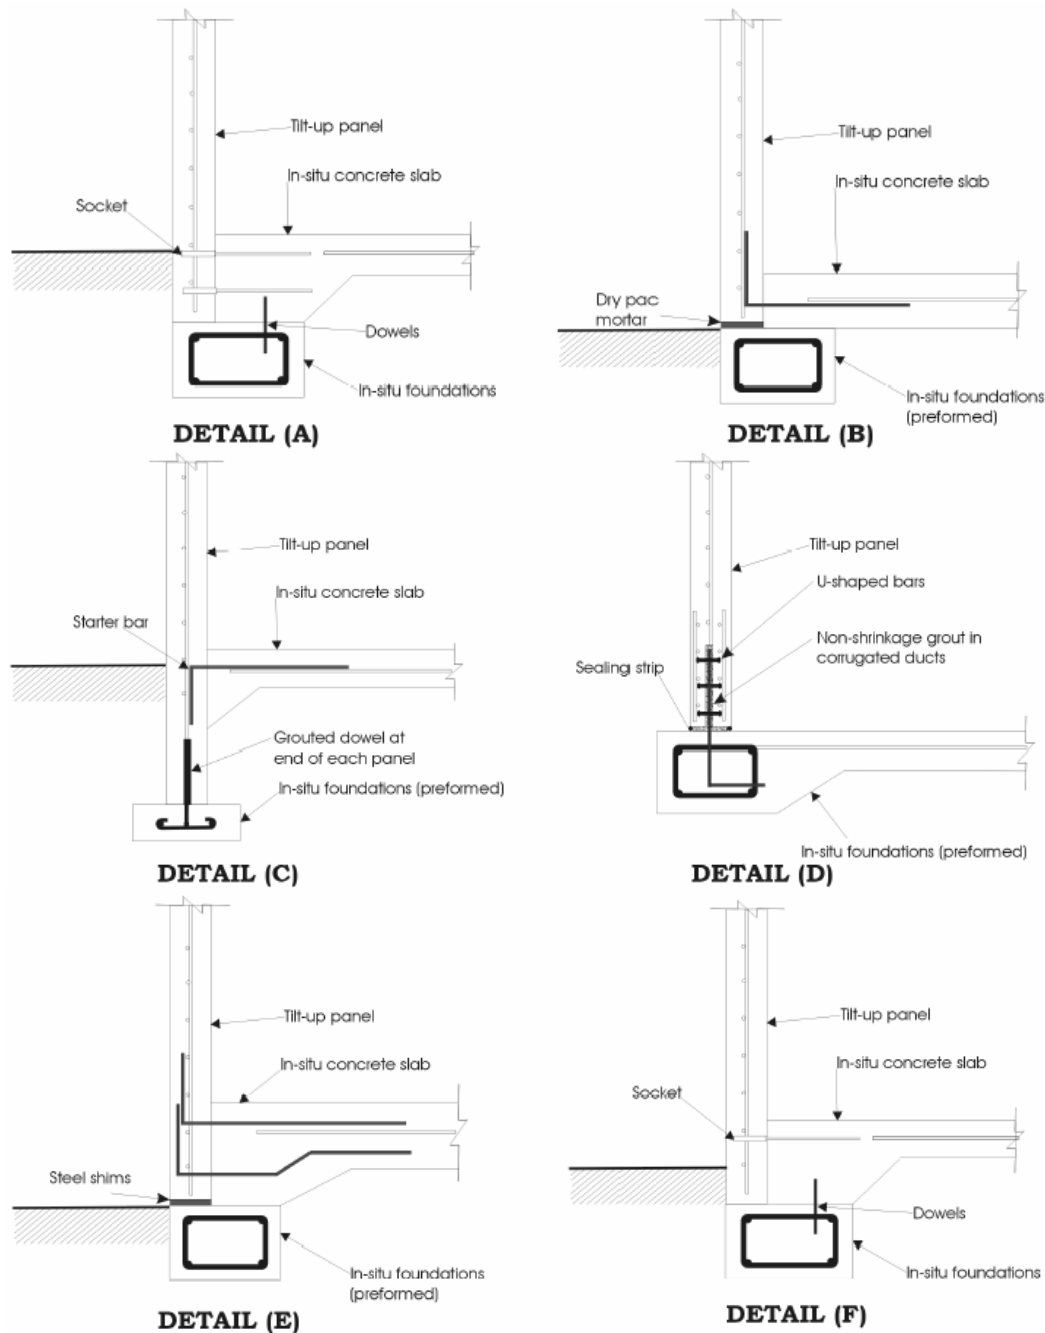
Typical base connection details for cantilever walls (Lim,2000)
